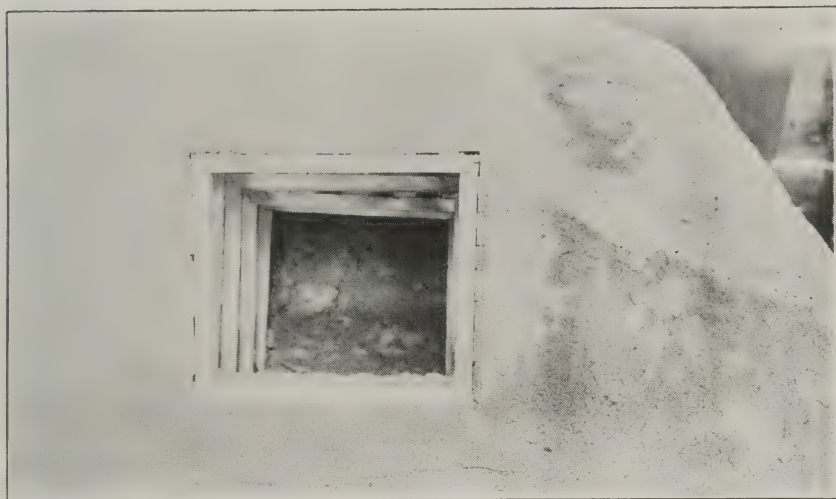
Section of Mine Gallery. Showing use of frames and sheeting.
